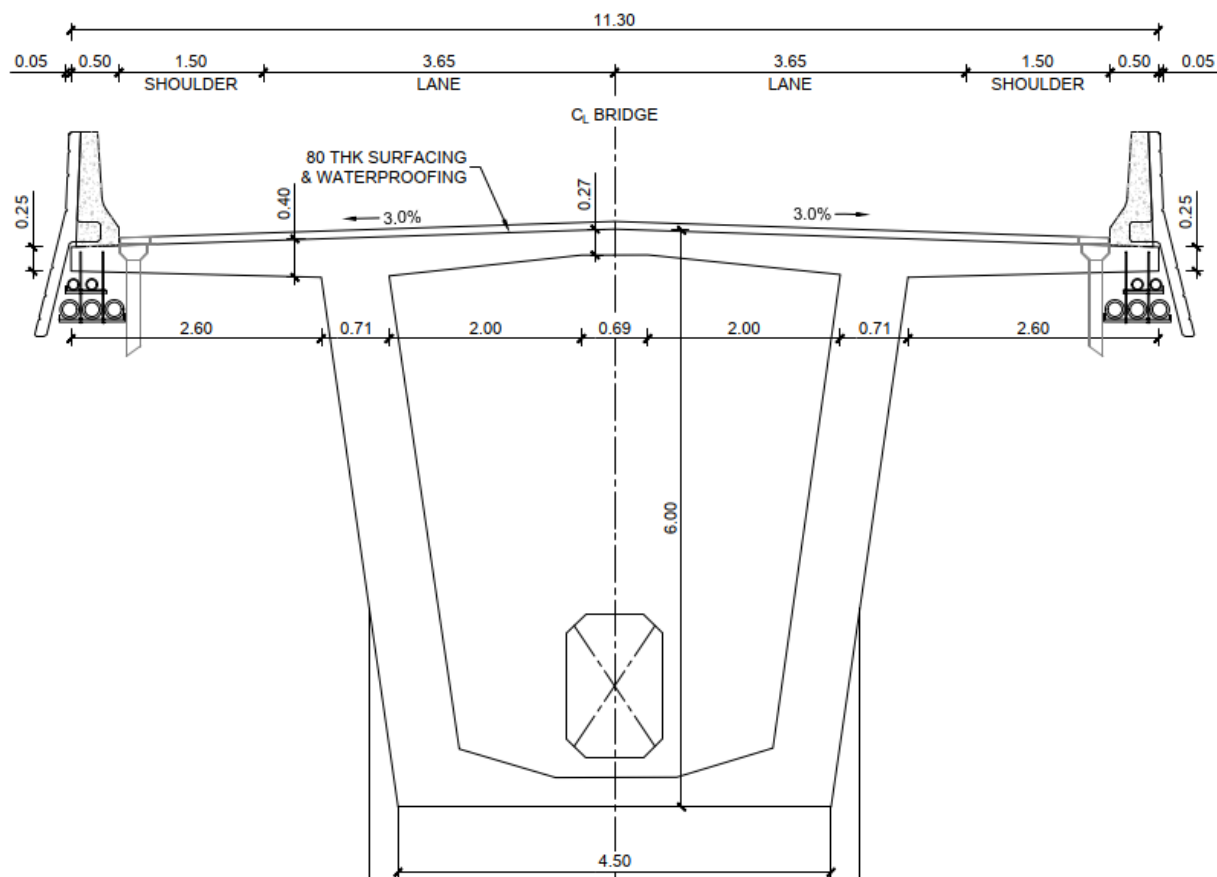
Typical cross section for Balanced Cantilever spans over pier (Main span) for Netrokona-Sunamganj
